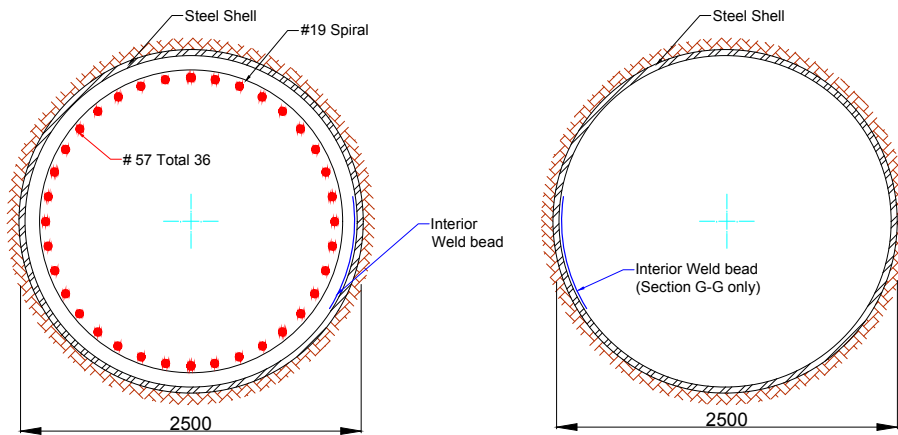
Cross Section at mid height of East foundation piles (Ref.: AutoCAD made by the author).
